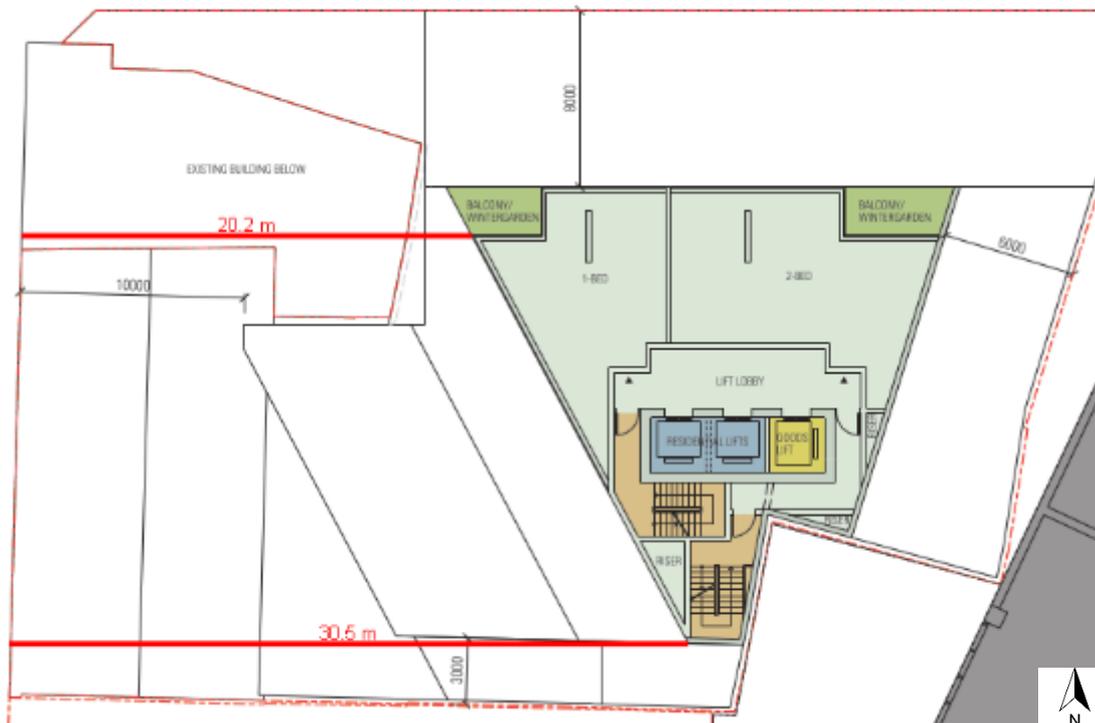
At levels 26-40, the tower is required to be setback between 20.2 metres and 30.5 metres from the George Street frontage
